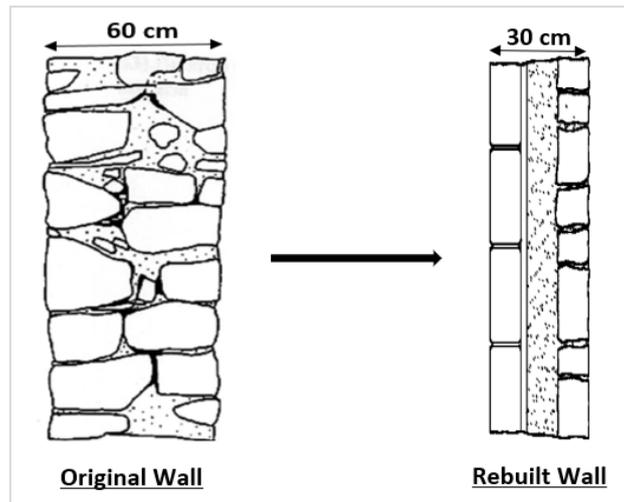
Transformation of Dana's original walls (Author 2020)
